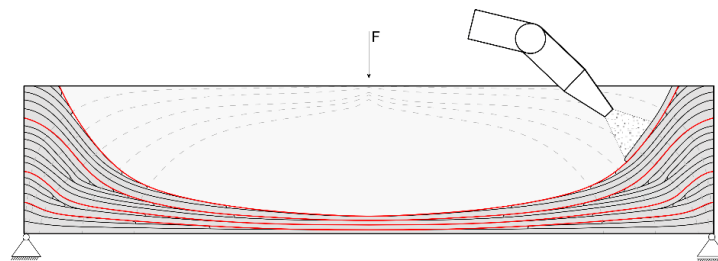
Manufacturing of a beam element with a force-flow-compliant reinforcement layout by using adaptive path planning in combination with interlayer reinforcement (red lines) (from [5]).
